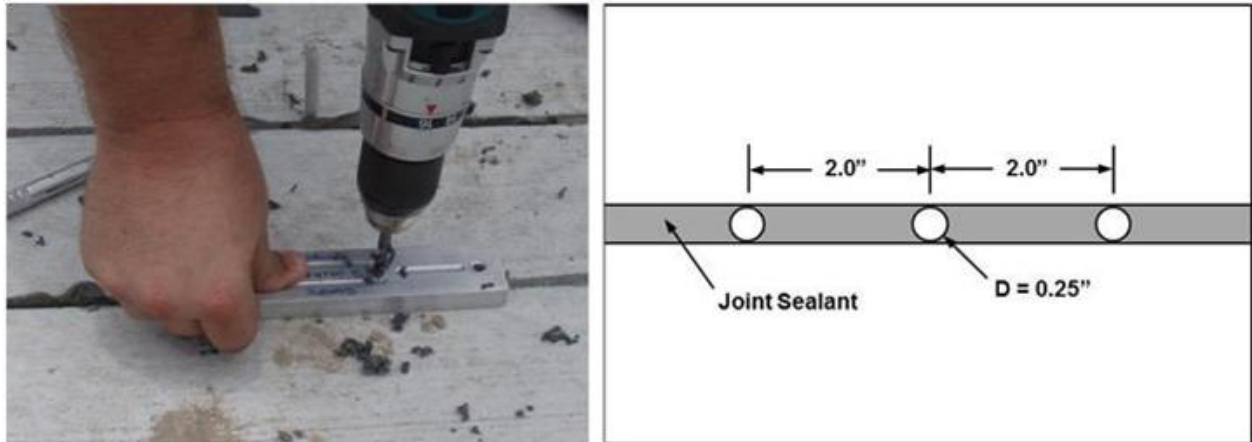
Drill three 1/4 inch diameter holes spaced 2 inches apart.
